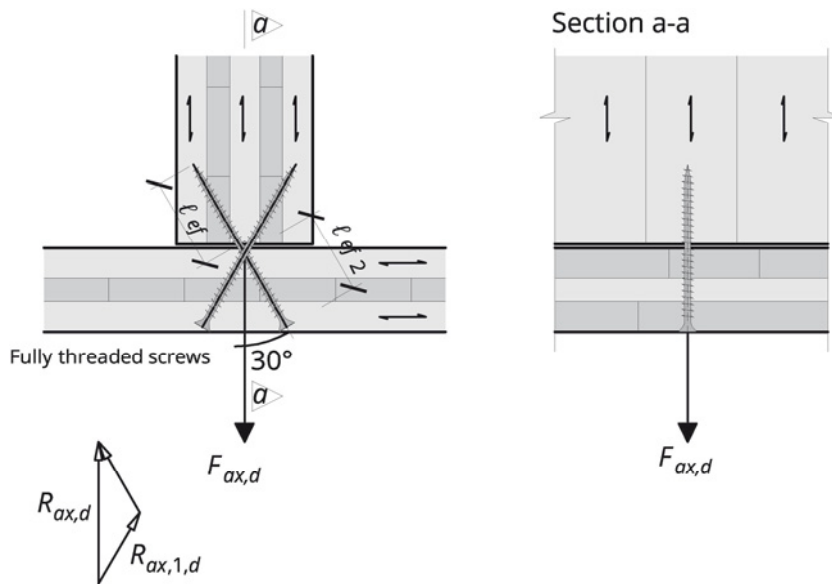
Suspension using fully threaded screws inclined out of the wall plane
